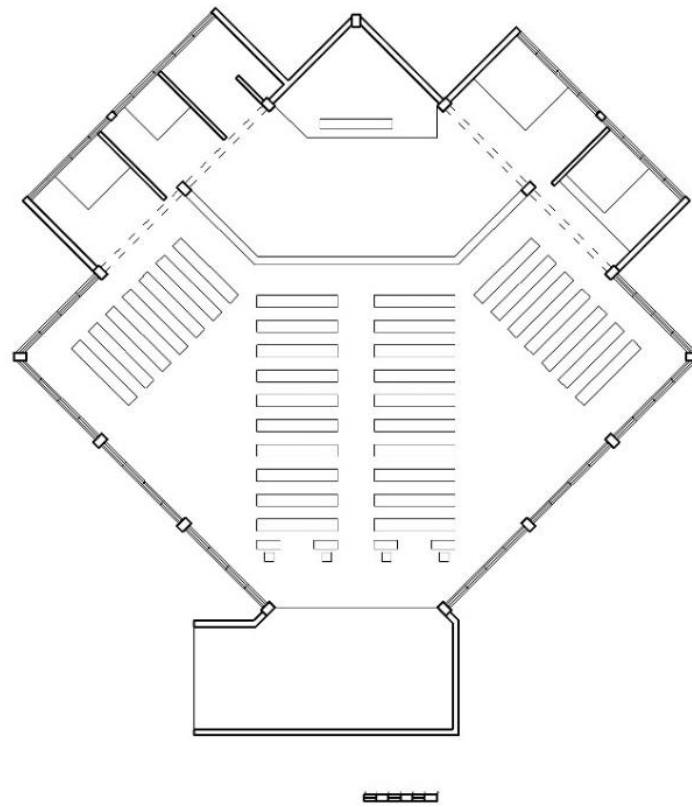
Floor plan of the second chapel of Ibadan Catholic archdiocese at Oke-Are built in 1965.
